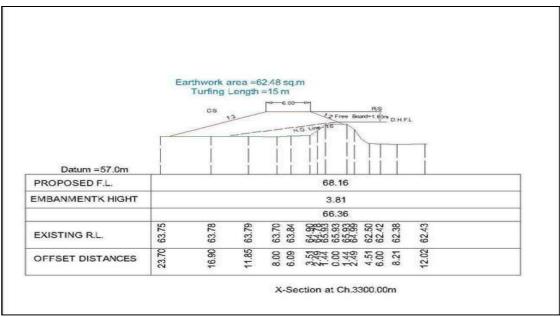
Typical Cross-Sections of Proposed Embankment Upgrading
